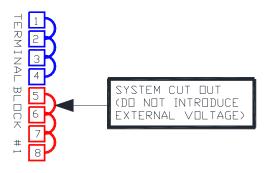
TERMINAL BLOCK W/ SYSTEM CUT-OUT
